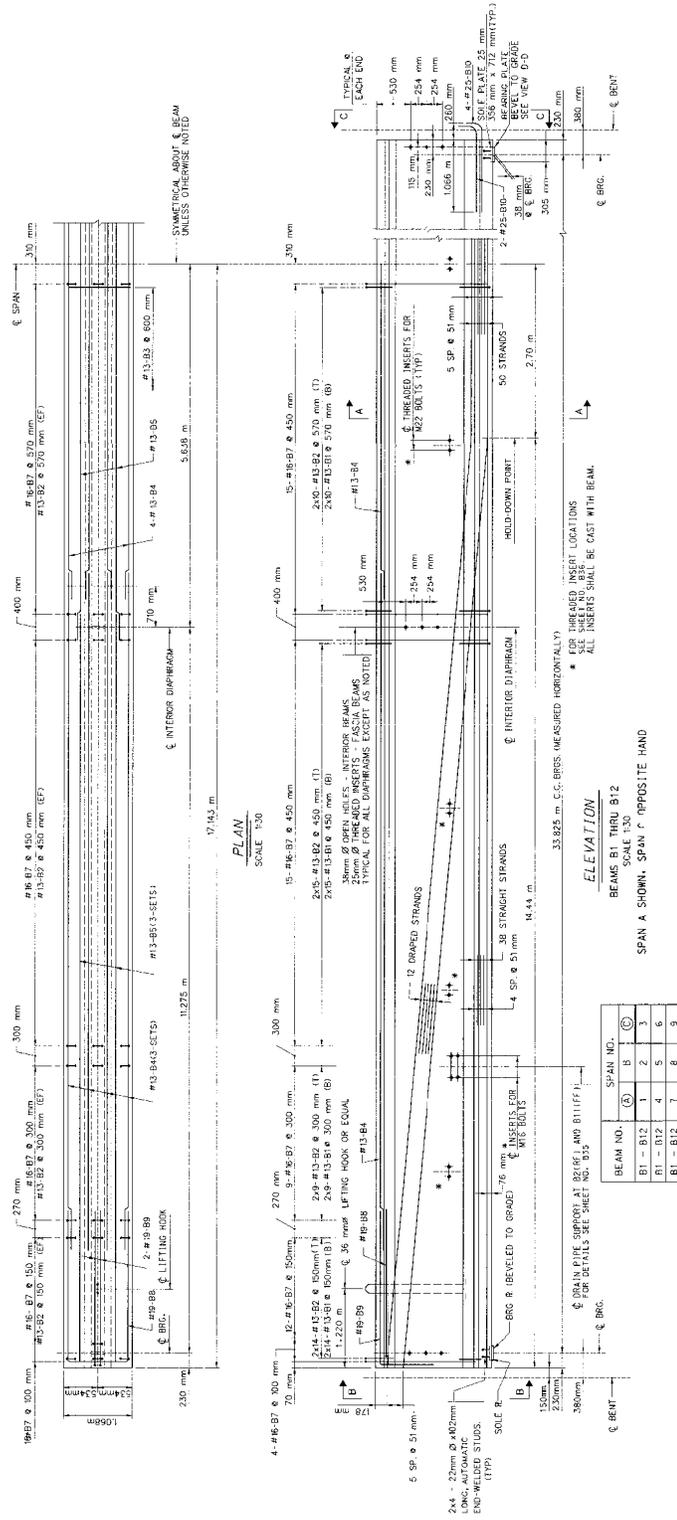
Beams B1 thru B12 Plan and Elevation (1/2)
